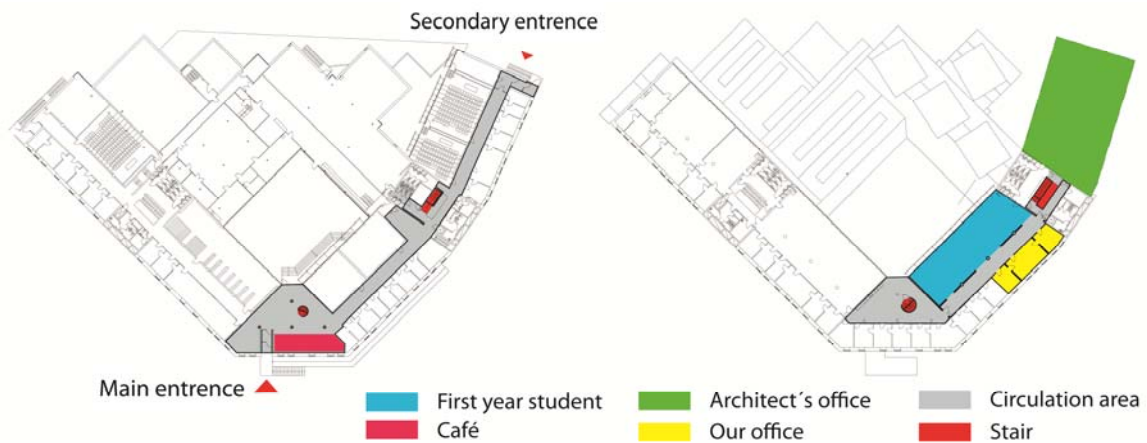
Entrance floor and floor one where our office is located. The gray area shows the spaces I use daily at the school of architecture, KTH.
